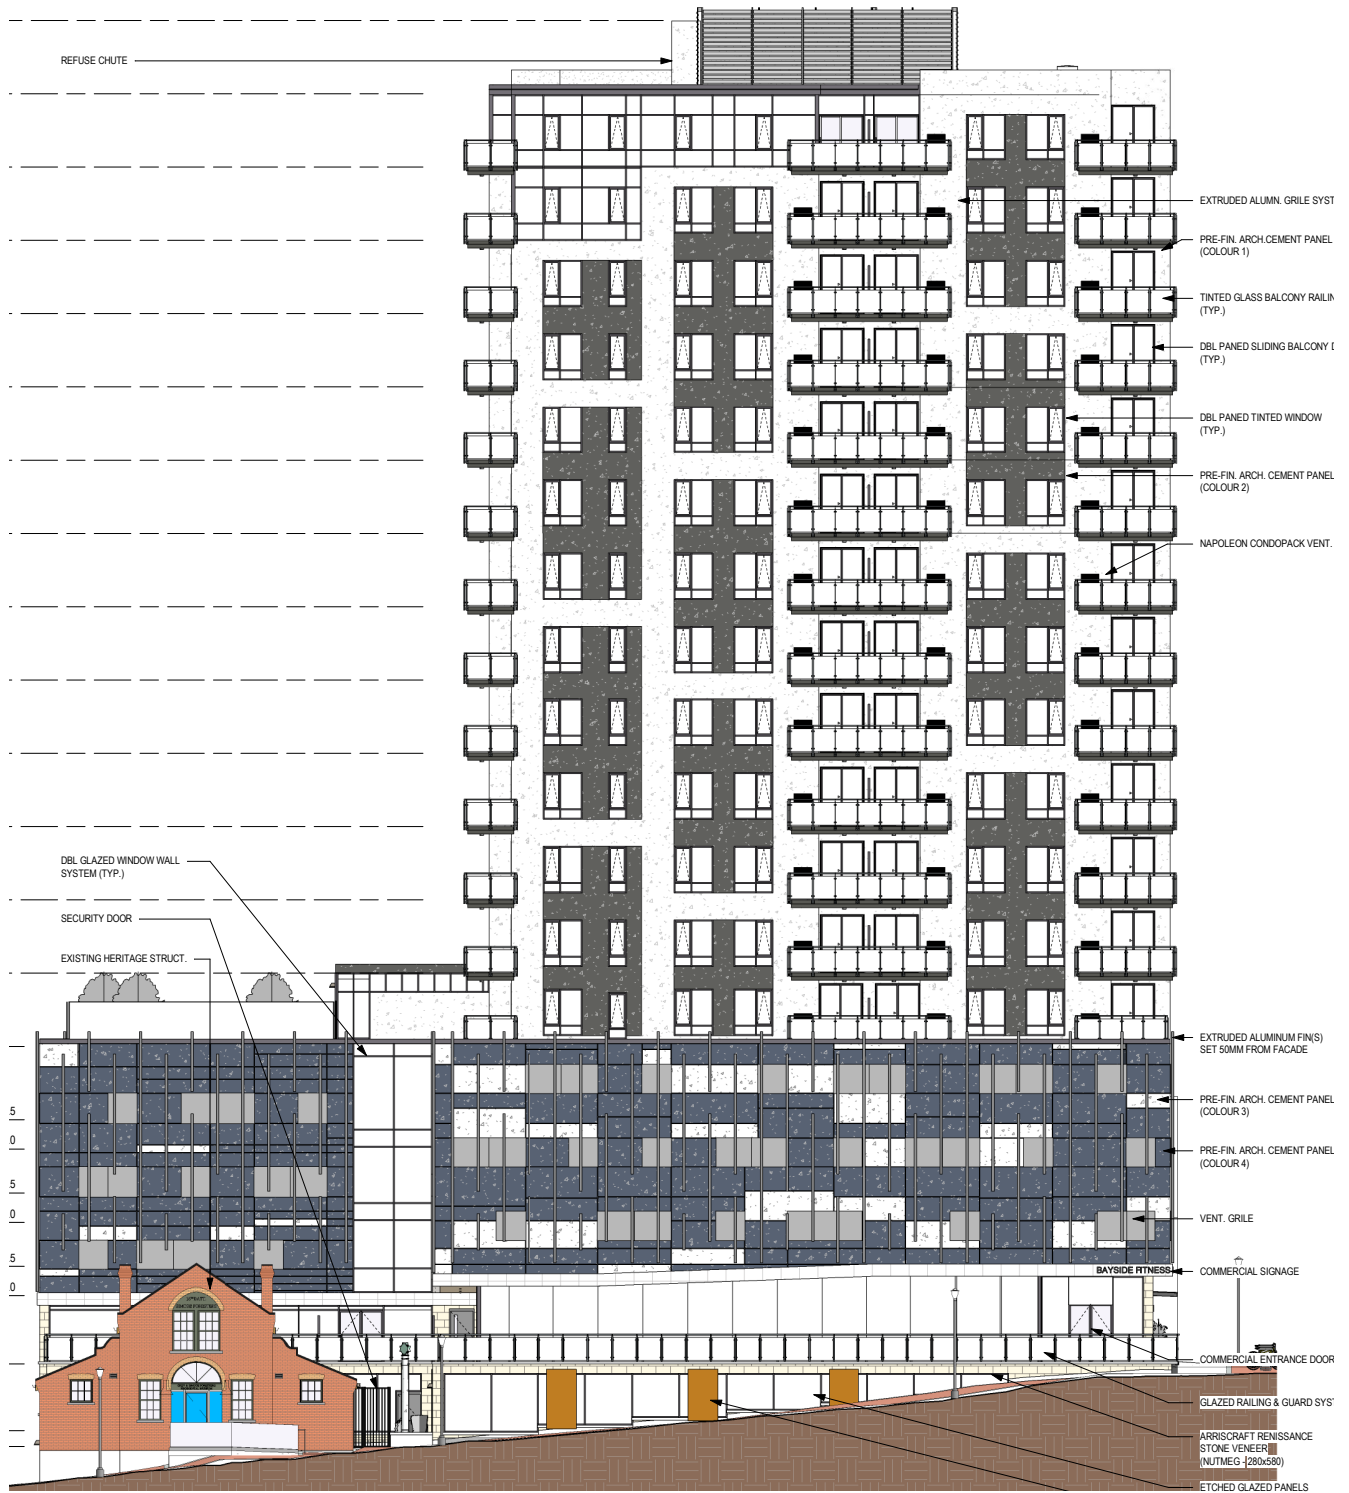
East elevation of the proposed building along Mulcaster Street prepared by MCL Architects.
